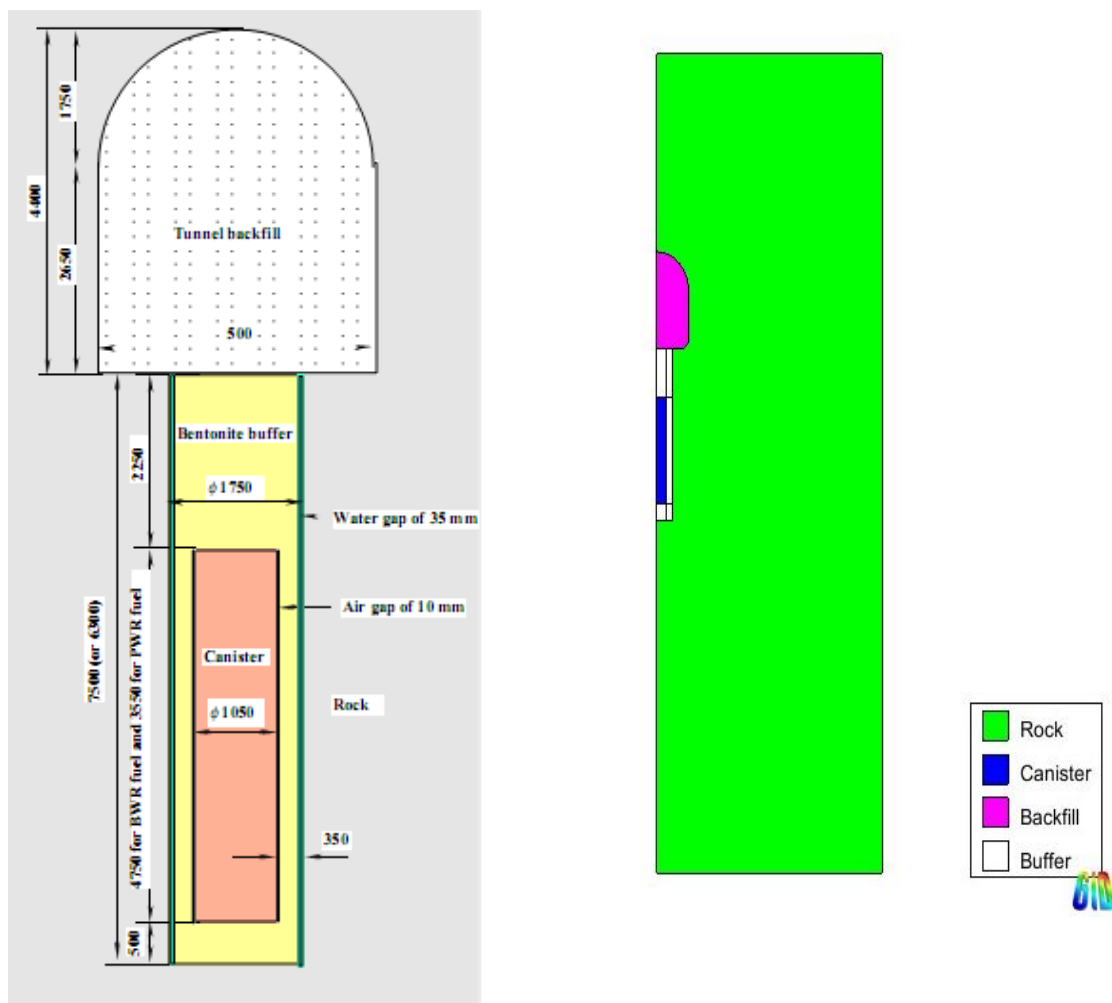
Dimensions (cm) of final disposal hole and tunnel
